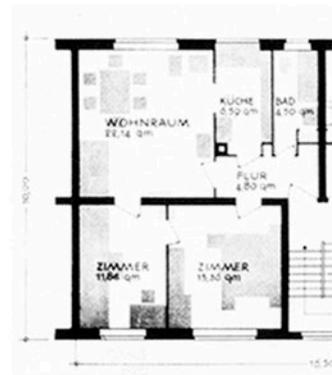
E. May, *Bruchfeldstraße*. (Frankfurt-Niederrad, 1926-27). Floor plan_1:250.
